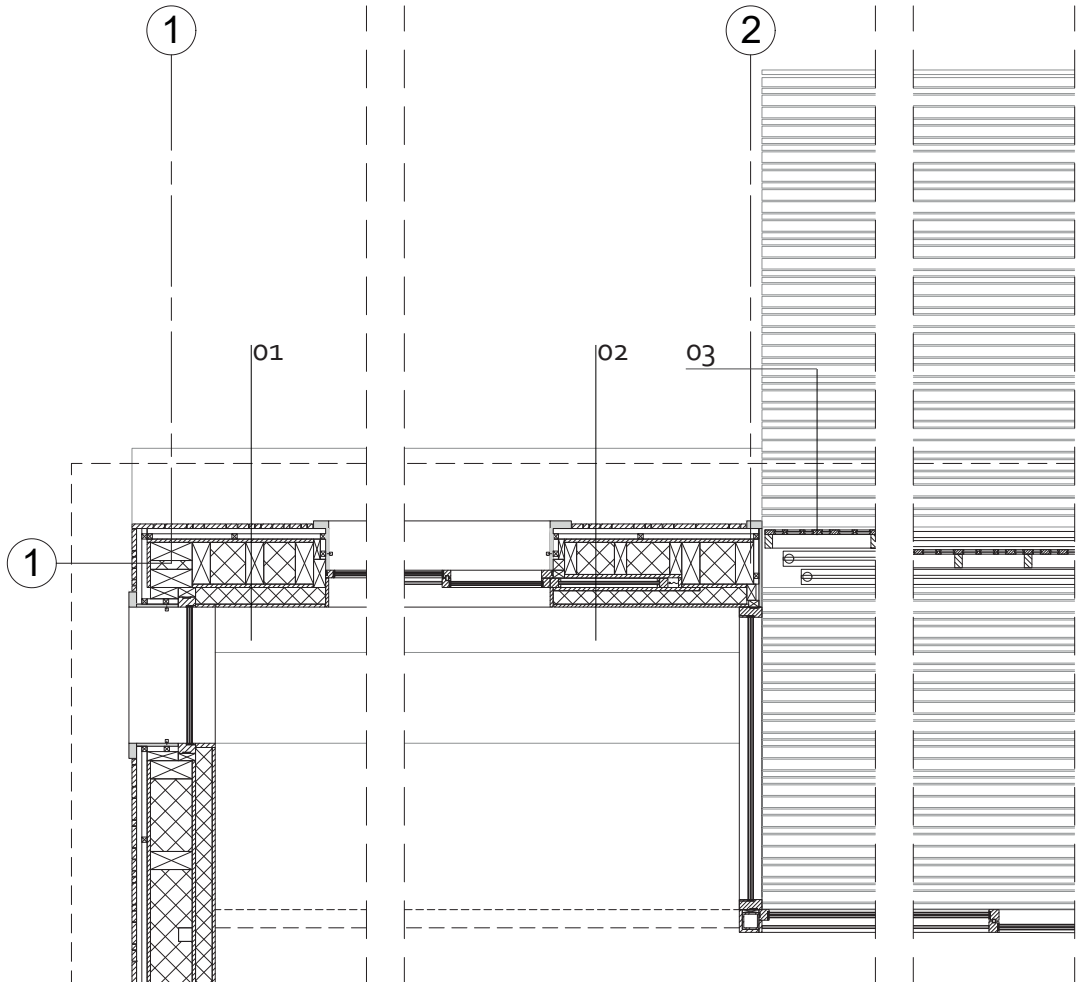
Section H1, detail of windows and winter garden living, 1:100
